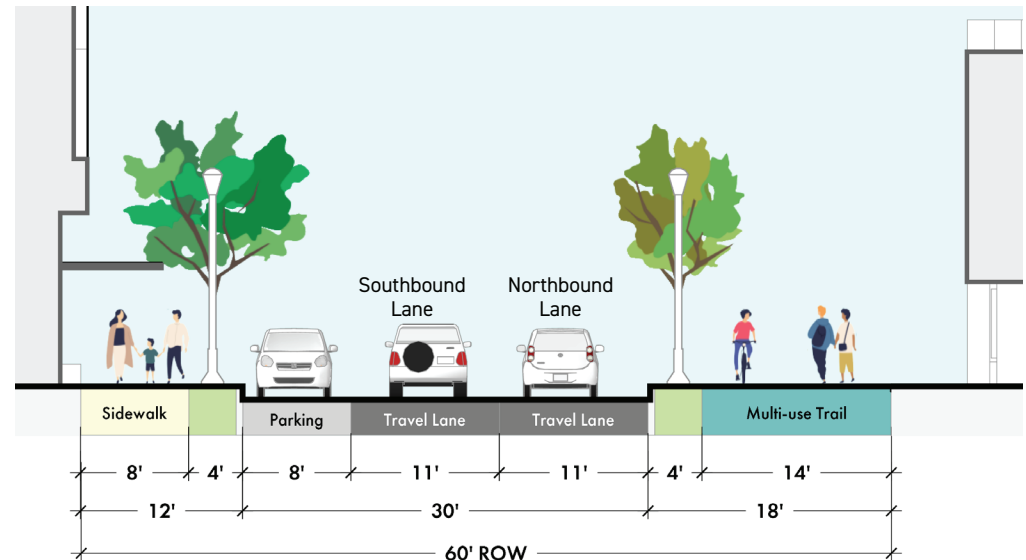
Proposed Typical Enhanced Street Section w/ Multi-Use Trail
